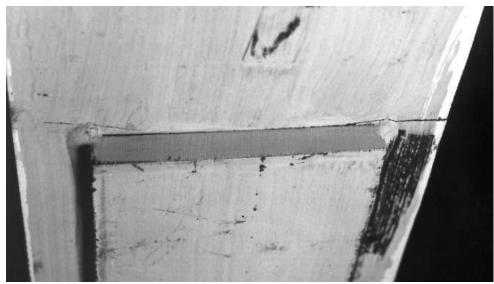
Fatigue Crack at End of Cover Plate Fillet Weld Toe
